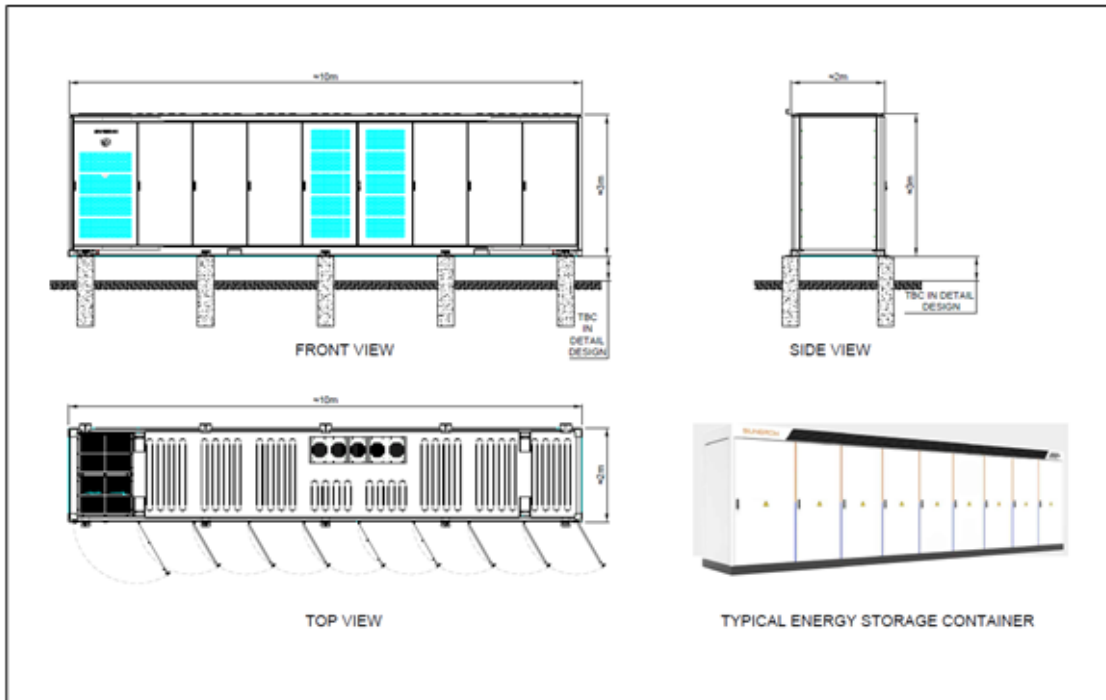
Proposed elevation diagram for the battery storage units by the Applicant
